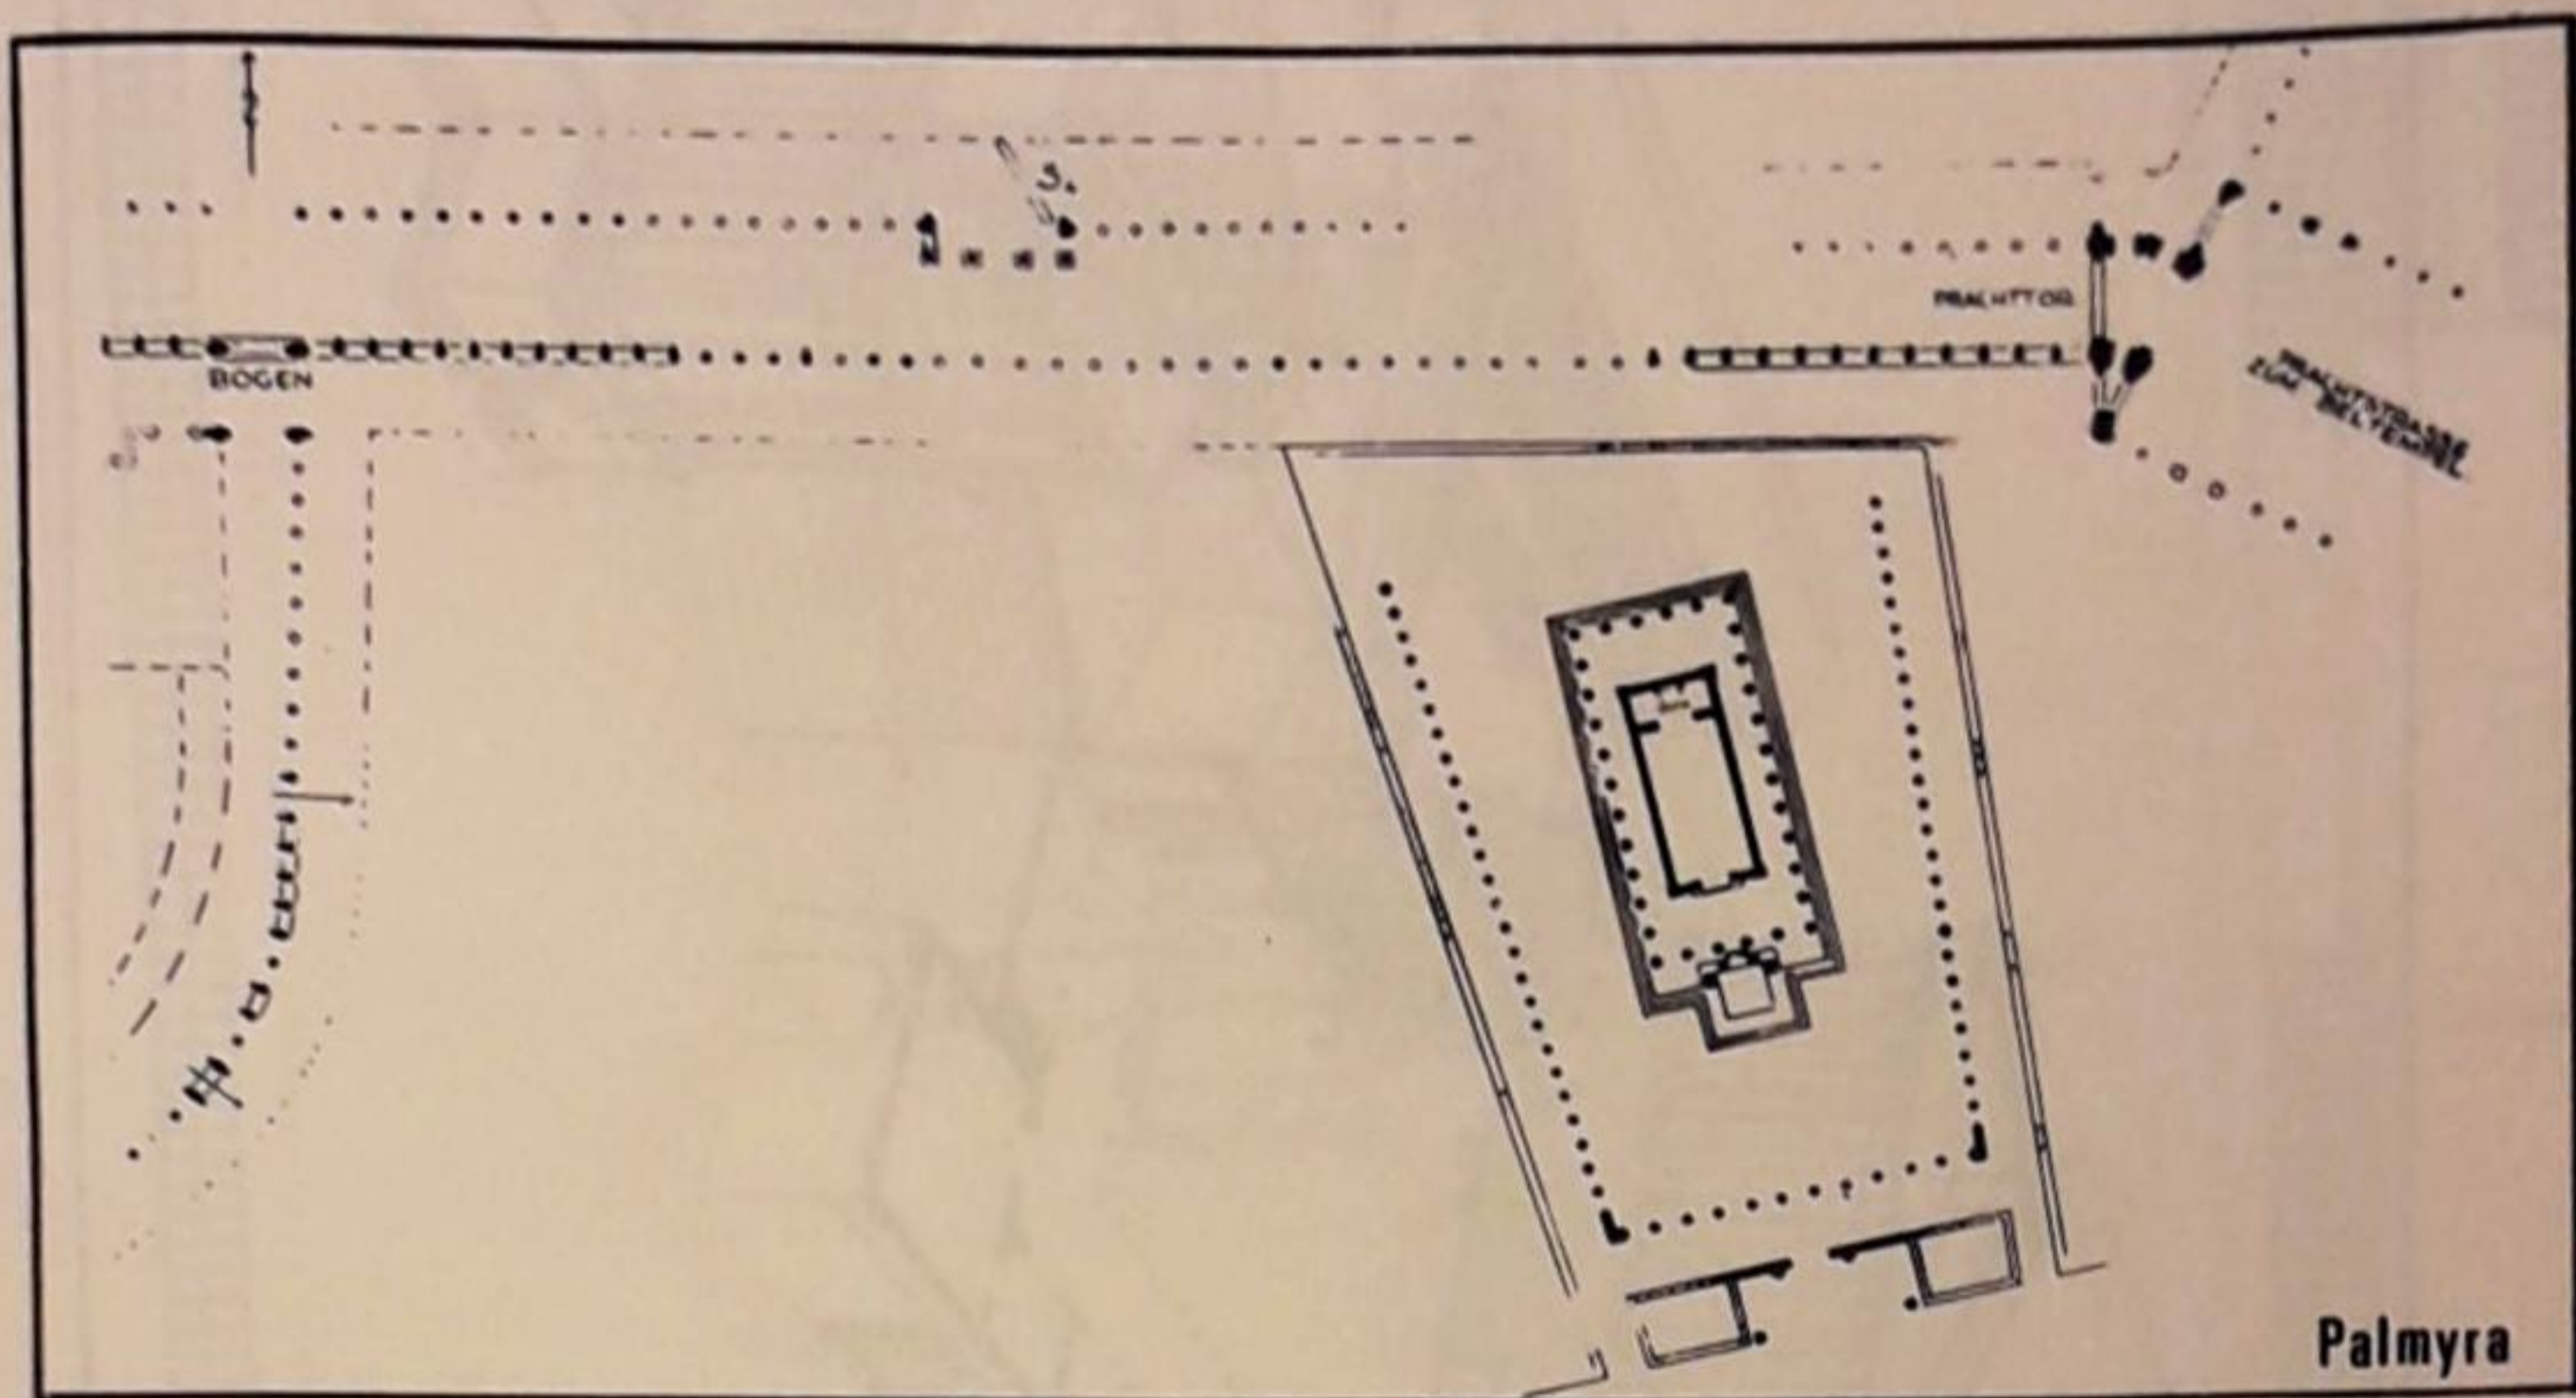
Palmyra, Sanctuary of Nebo, section of the main colonnade street and the triumphal arch.
